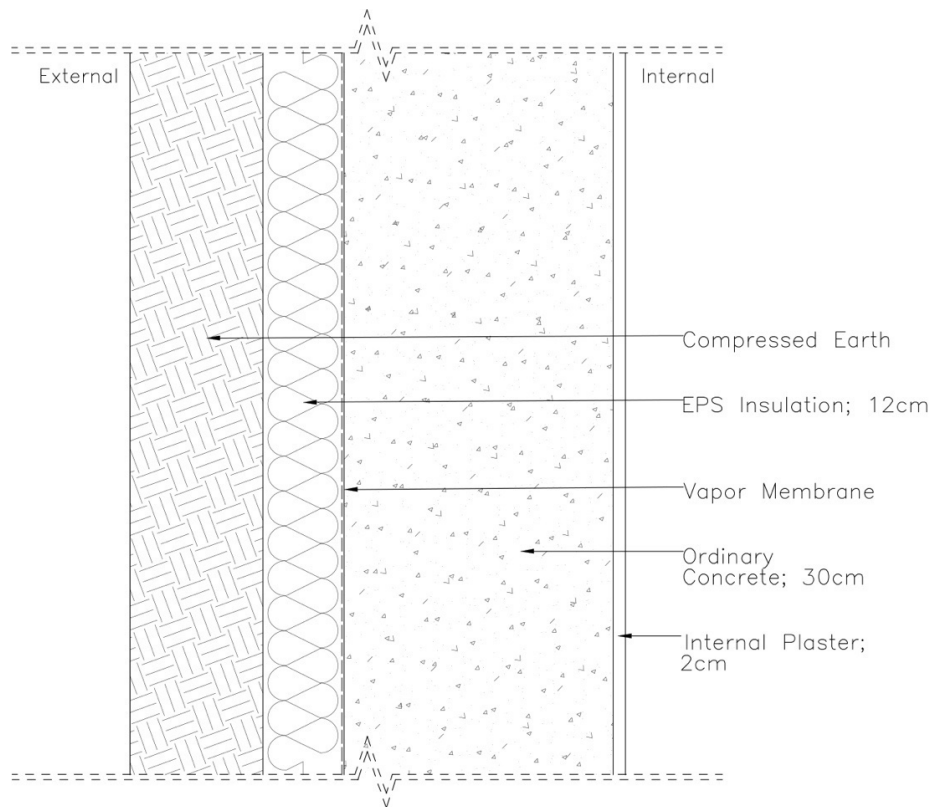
Concrete Retaining Wall Stratigraphy. Reference: Author.
